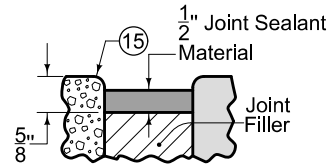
Detail F or Detail G (See Bar Size Table for Doweled Expansion Joints)
